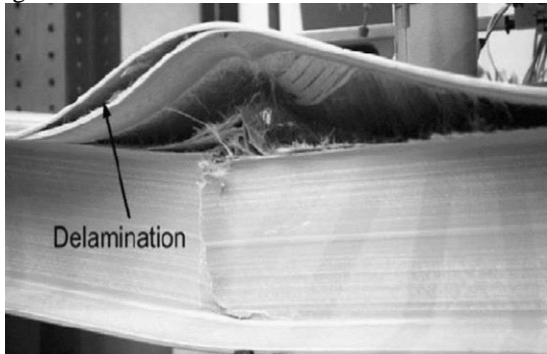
Shear failure in FRP bridge deck [1]
